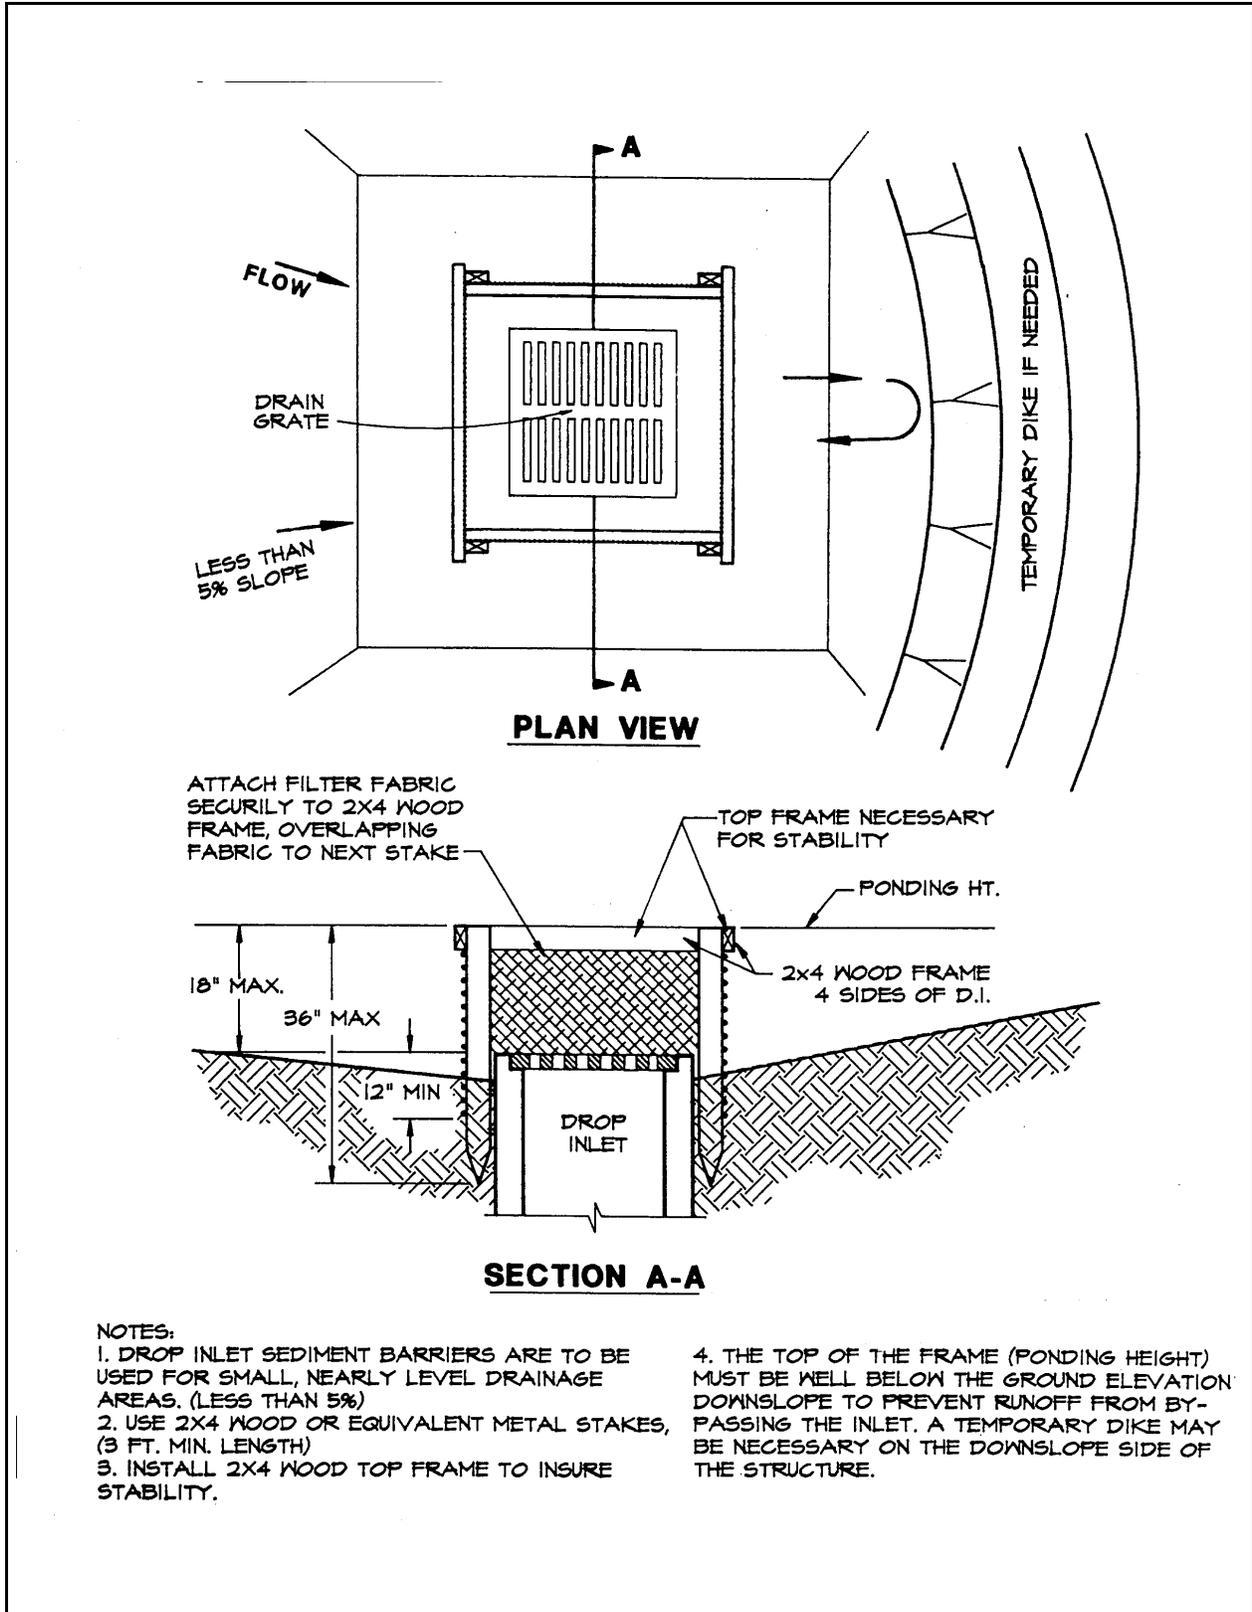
Silt Fence Drop Inlet Sediment Barrier
